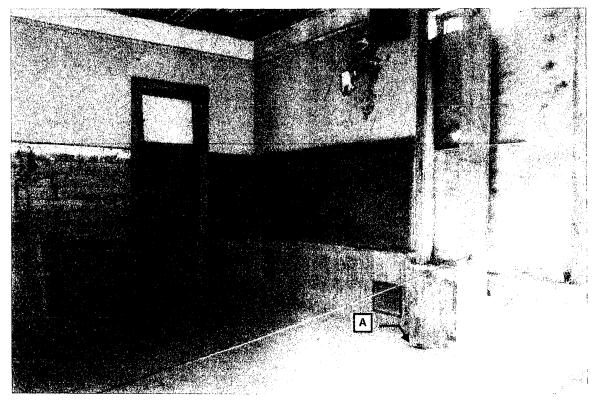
Room 15 view northeast. (A) Irregular-shaped hole in floor.
